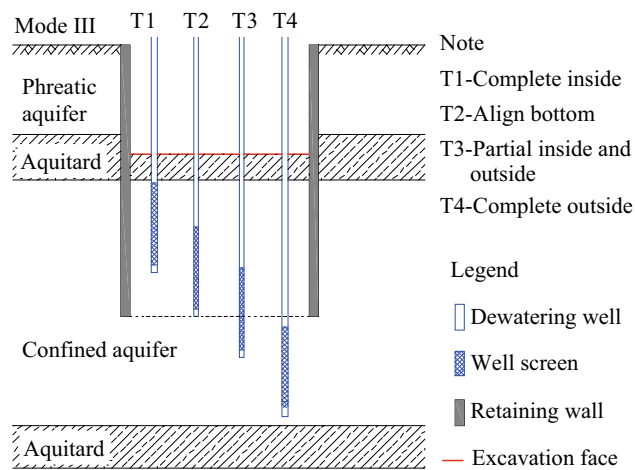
Types of interactions between the retaining wall and dewatering well when using dewatering mode III in Shanghai. Modified from Wang et al. (2010)
